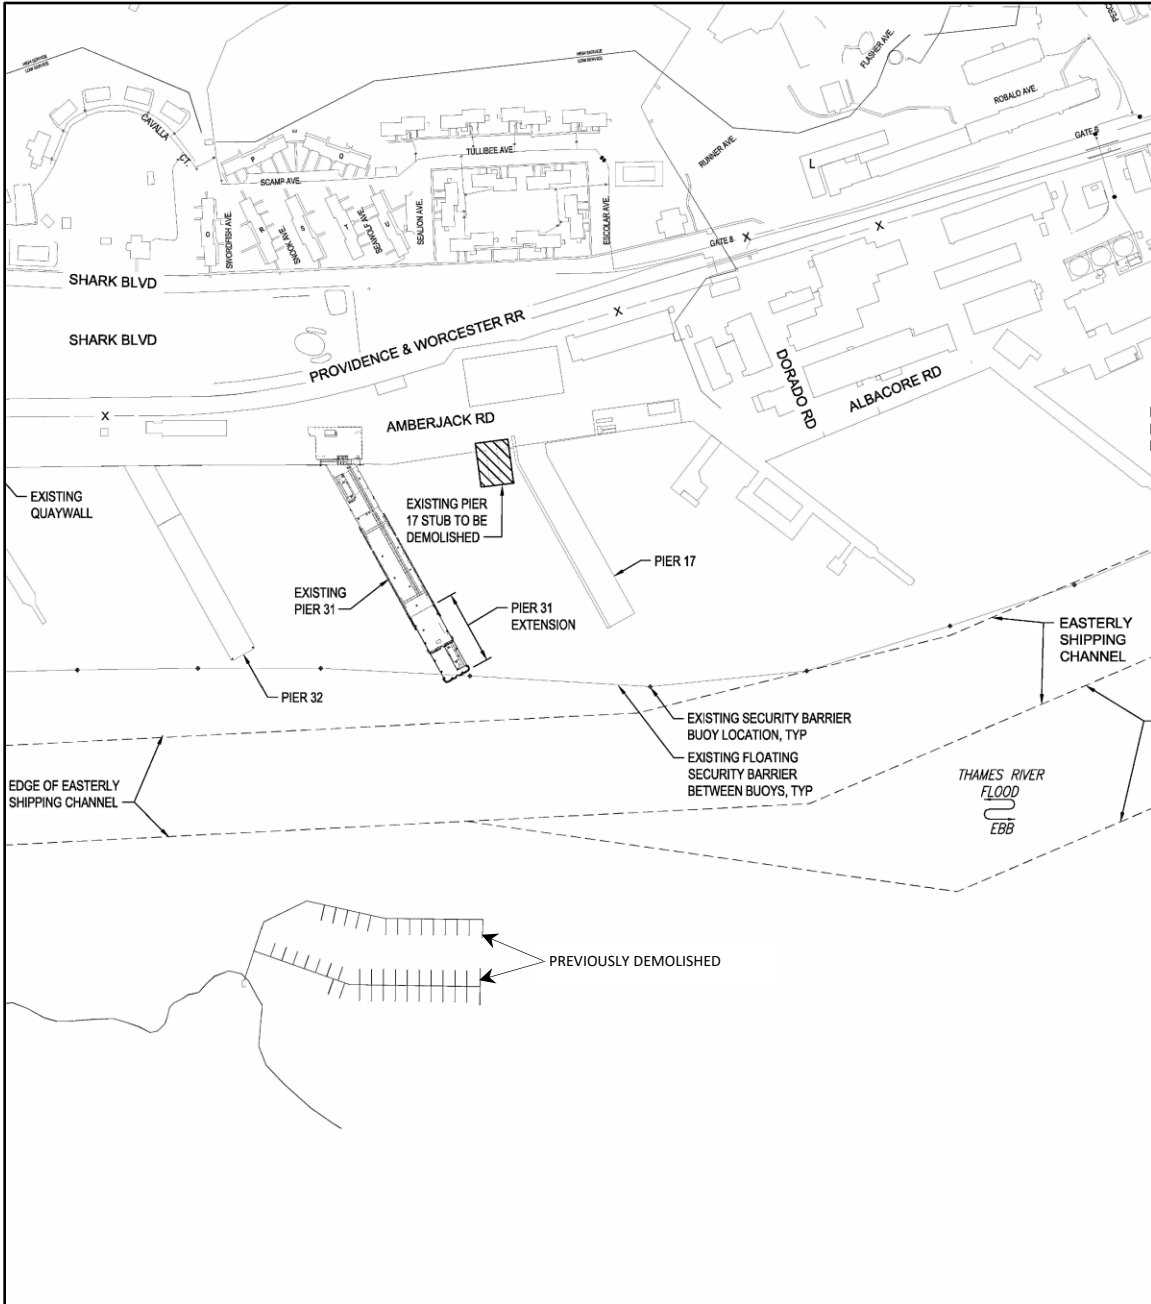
Plan View of Pier 31 Extension and Pier 17 Stub
